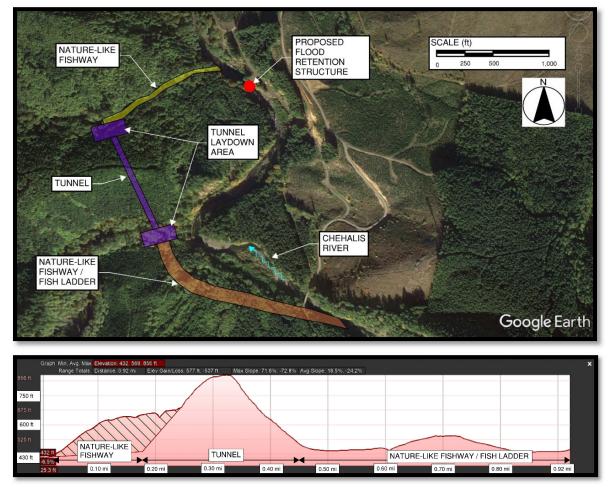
Nature-like Fishway/Fish Ladder Potential Construction Footprint Scenario 1¹
